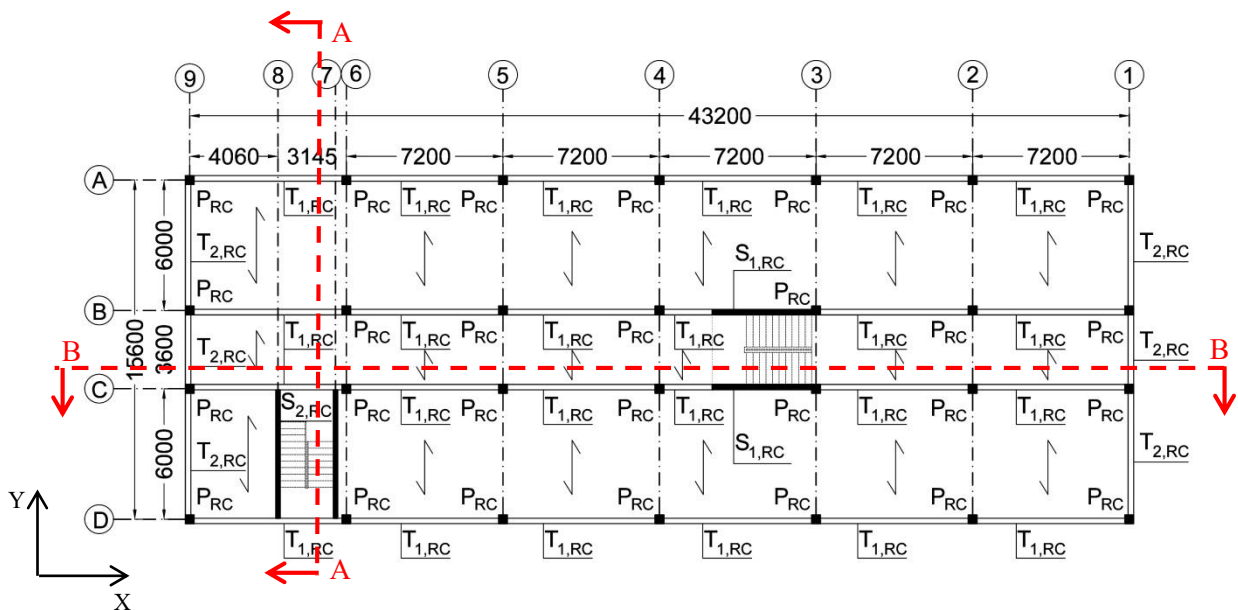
Ground floor plan with alphanumerical alignment identification and R/C beam numbering
